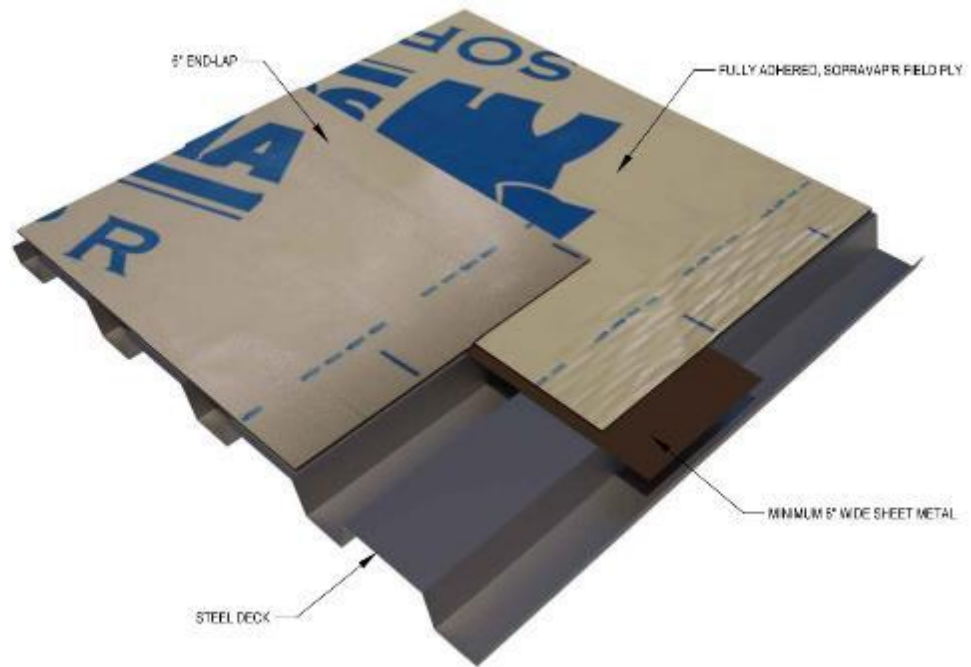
Fully Adhered, Self-Adhesive SOPRAVAP'R End-Laps On Steel Deck
